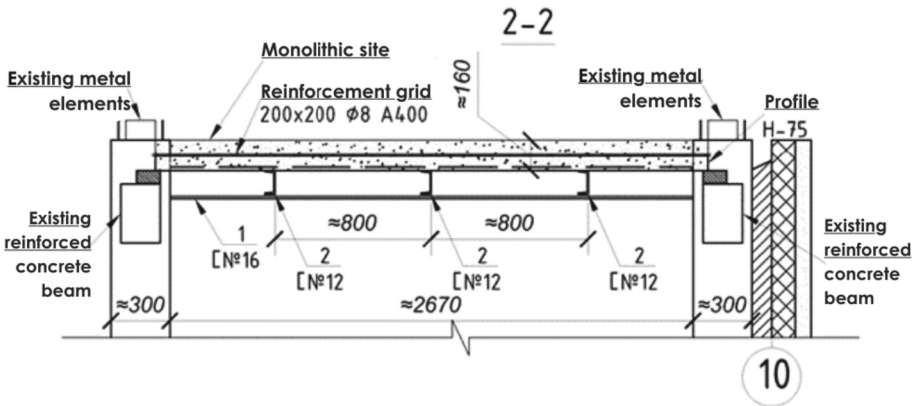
Scheme of arrangement of fixed formwork and cover slab. Cut 2–2.
